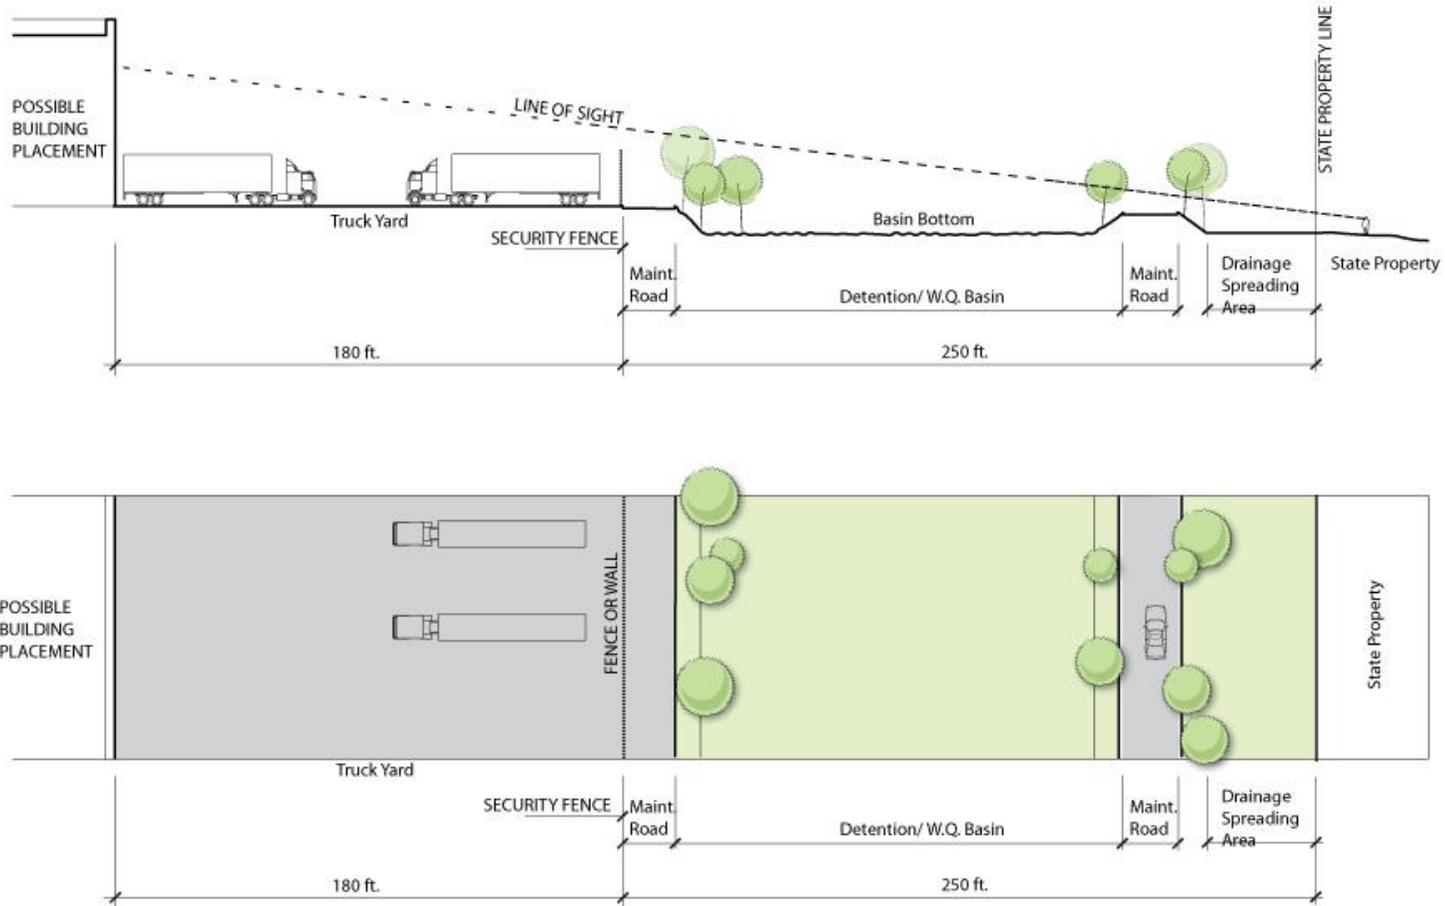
, 4-18 Southern Boundary Section I and Plan View I
